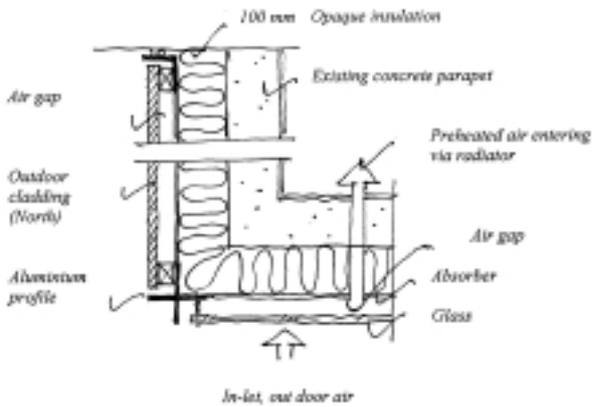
Horizontal cross section of the ventilated solar wall and the glazed balcony
